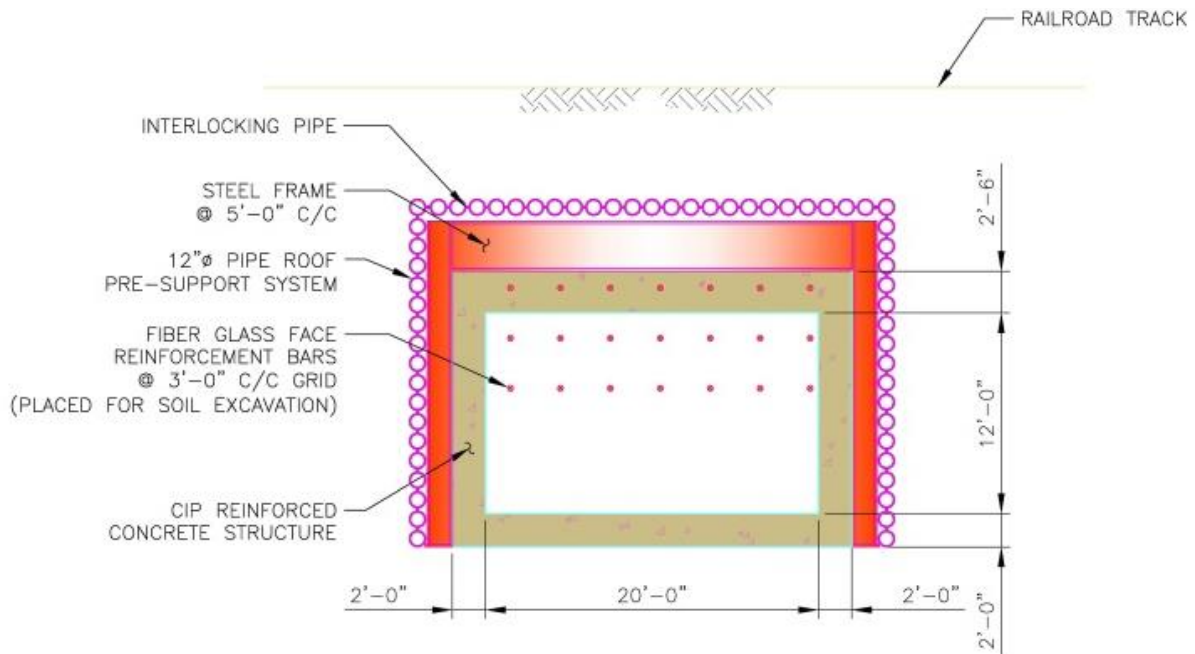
Typical Longitudinal Section of the Pipe Arch/Flat Tunnel
